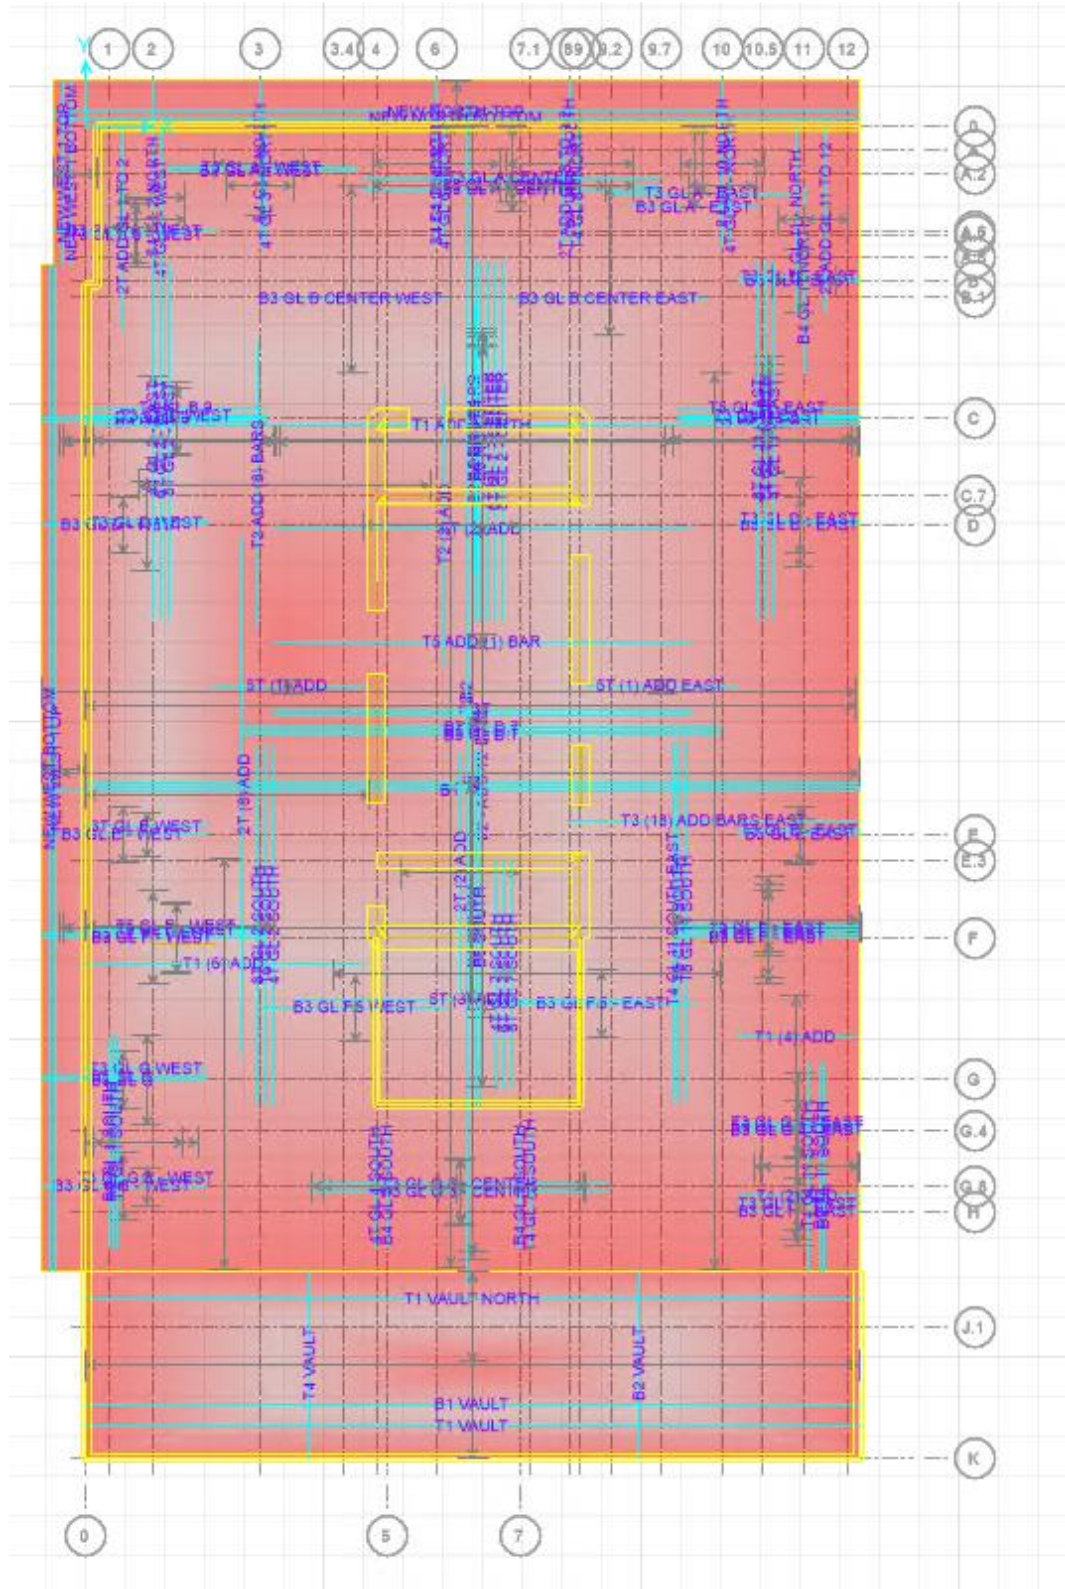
Steel Reinforcement Definition Layout in SAFE
